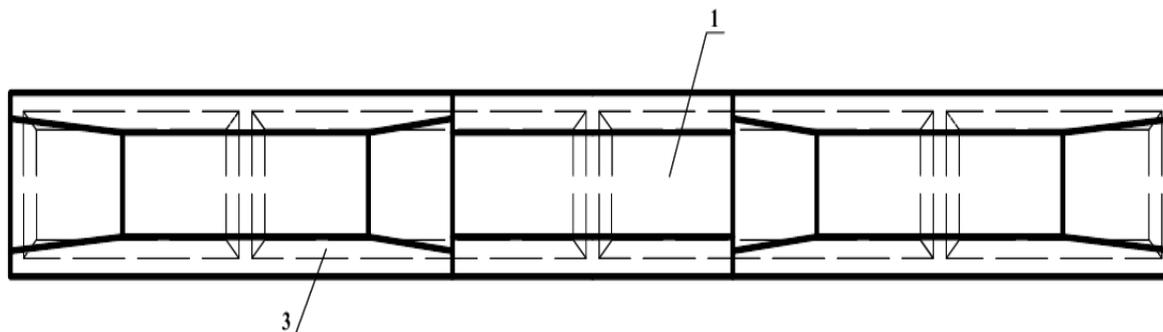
Reinforced concrete sleeper with a ribbed support part.
